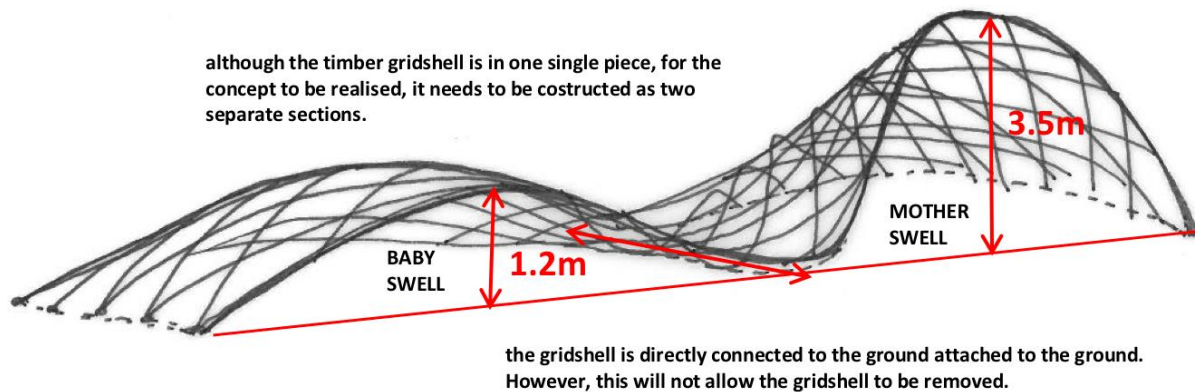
The existing timber gridshell with a central section resting directly on the ground will not allow the gridshell to be removed from underneath the concrete shell easily.
